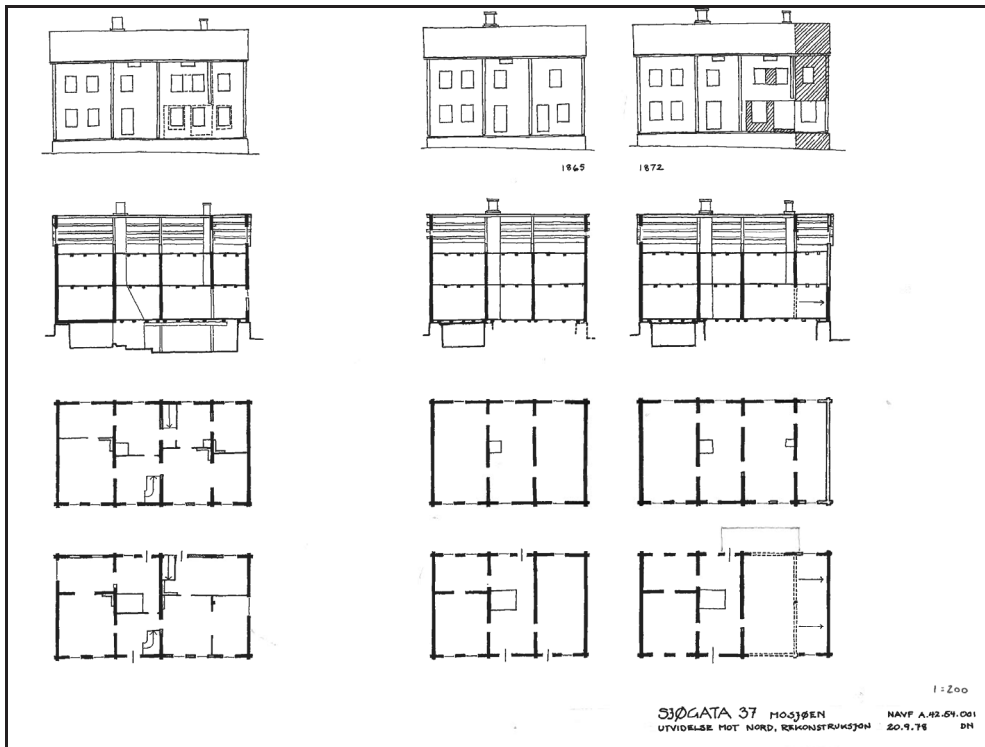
Sjøgata 37, reconstruction of the northward extension in 1972. Ground floor plan below. NAVF 20.9.1978 D.N. (Dag Nilsen private archive)
